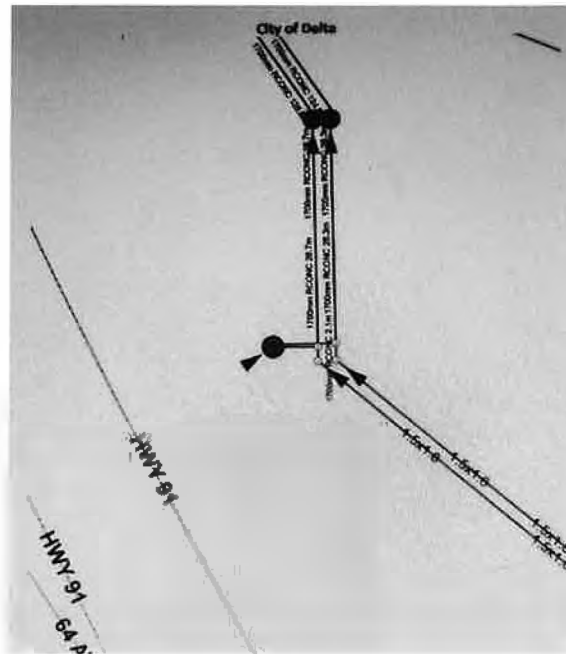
City of Delta connecting sewers to metro Vancouver trunk Sewers
